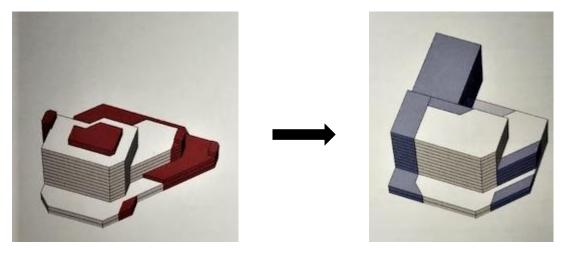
LEFT OLD BUILDING AND RIGHT NEW BUILDING (PPS RIJKSKANTOOR DE KNOOP UTRECHT, 2015)
